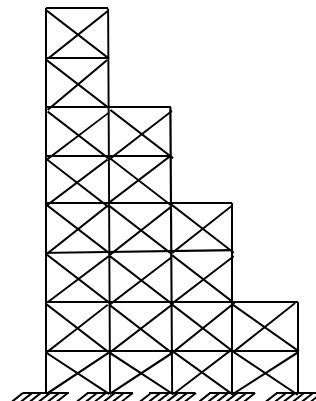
Vertical Geometric Irregular Building (2D Frame)
